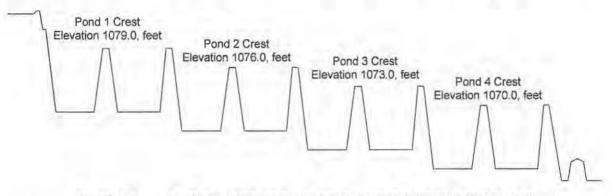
Section – wastewater Ponds 1 through 4 (view looking west)
